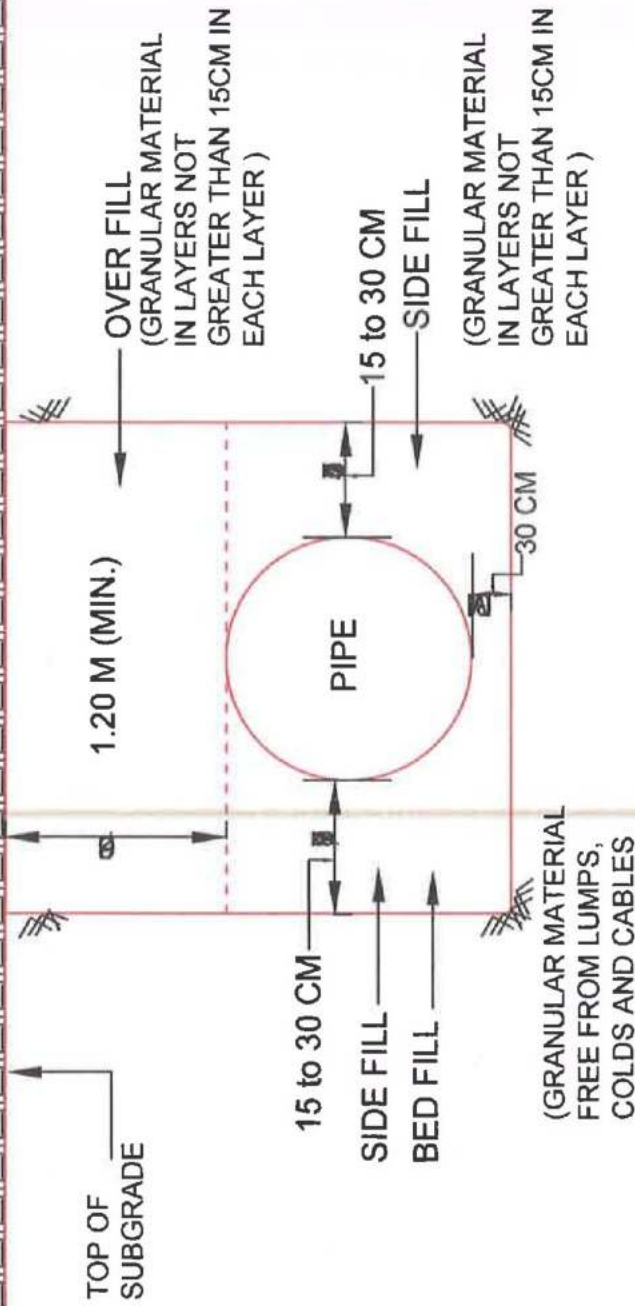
INSTALLATION OF PIPE FOR ALONG THE ROAD
